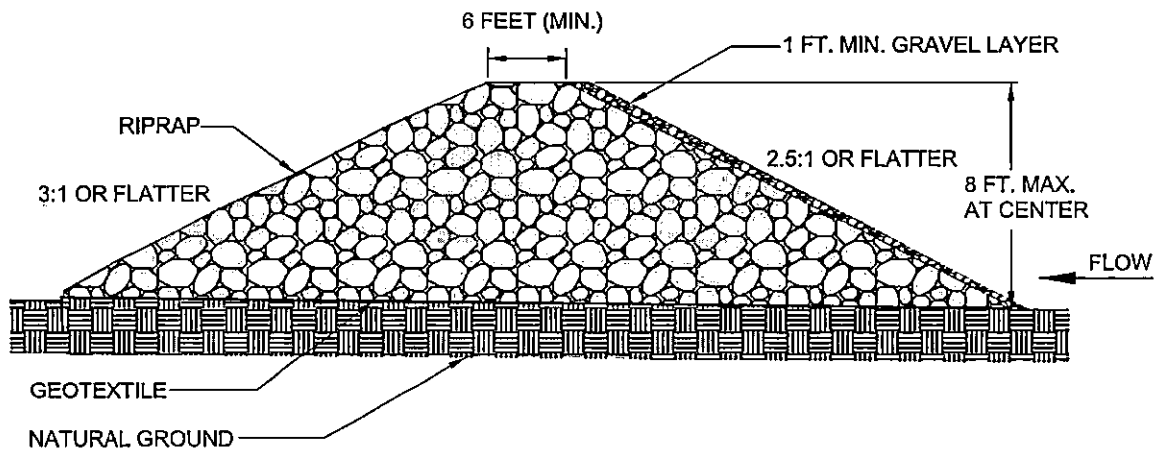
TYPICAL SECTION OF ROCK FILTER DAM
